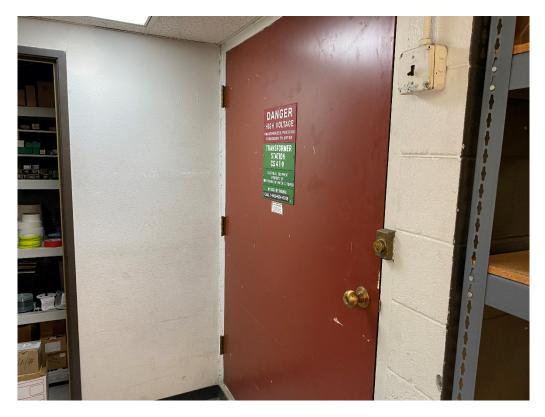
Equipment Room located in the northern portion of the building (06/01/2021).
